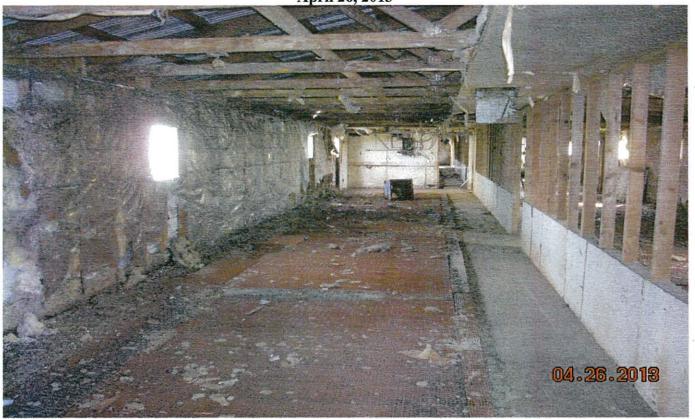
Interior of a swine confinement building is shown. A tip tank for gutter flush in background.
